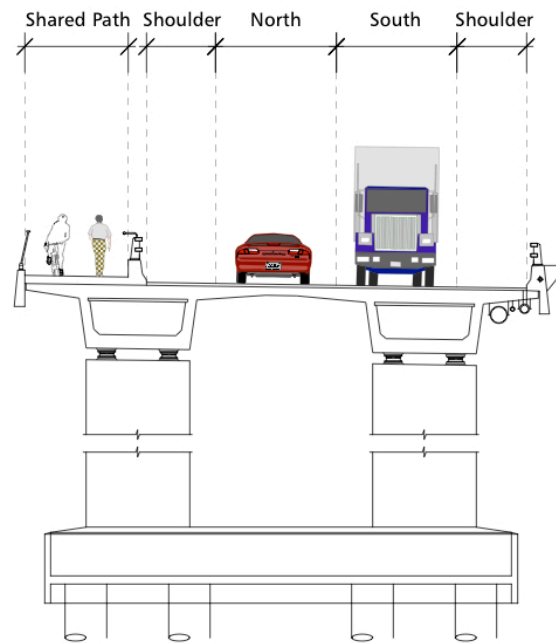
Typical cross section of the replacement bridge (two lane bridge).
